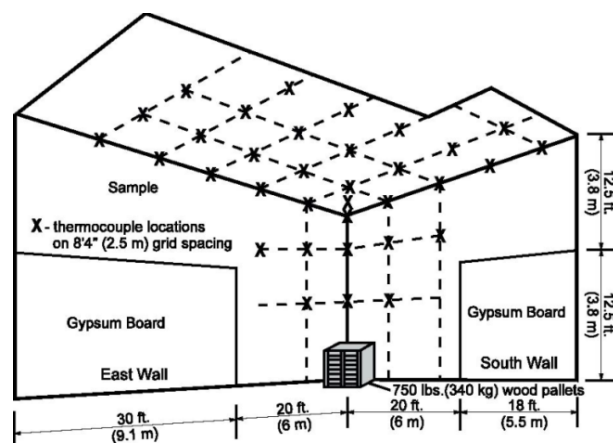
25 ft (7.6 m) Corner Test Structure
